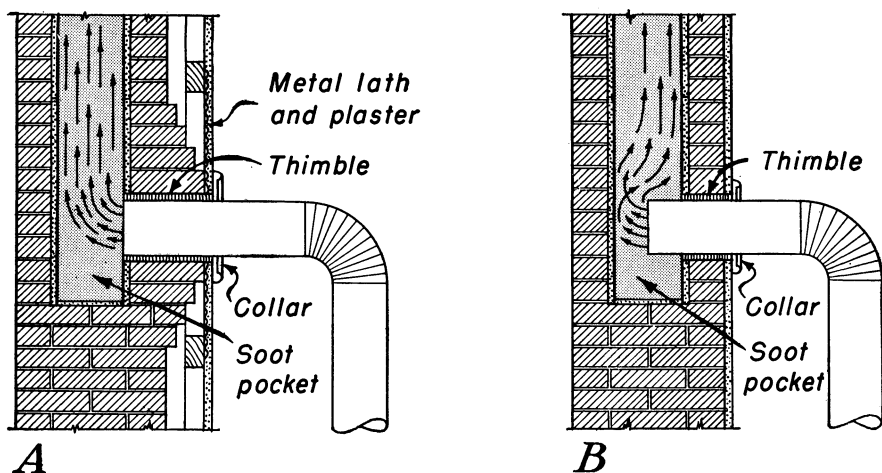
A*, Smoke-pipe connection through a furred wall. Bricks are built out to the wall to support the thimble. *B*, Connection through a chimney wall without furring. Note that the pipe extends too far into the flue; it should be as shown in *A*.
